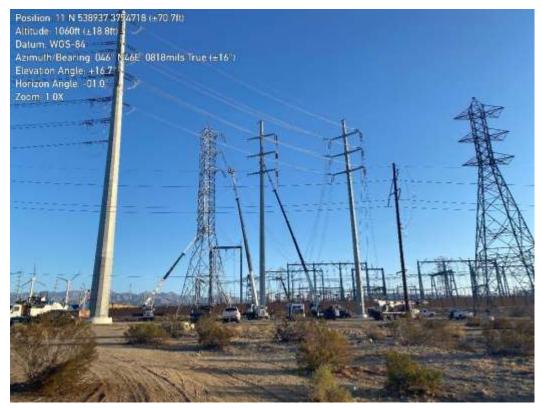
Wire wreck-out activities at Construction Area 6X08, Segment 6 (April 1, 2021) (Photo courtesy of SCE).
